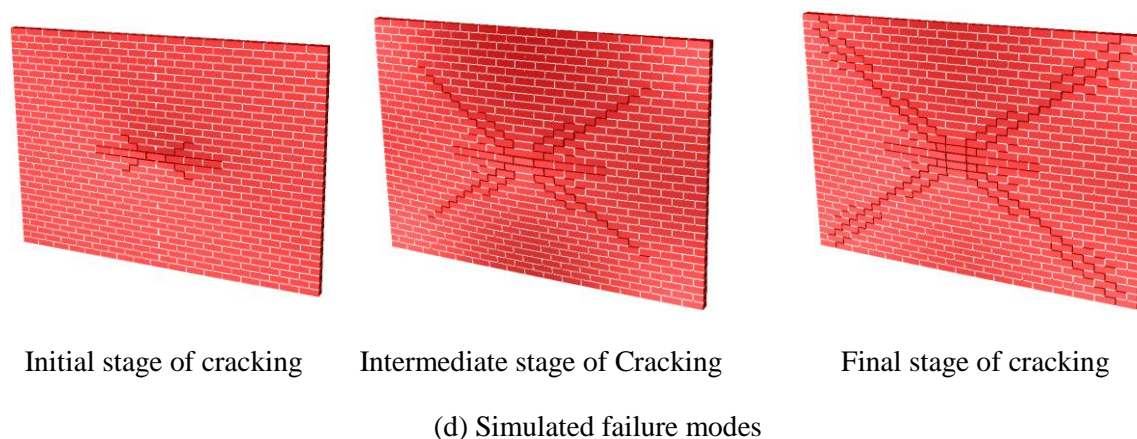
Masonry wall (TUD, COMP11) under out-of-plane cyclic loading
